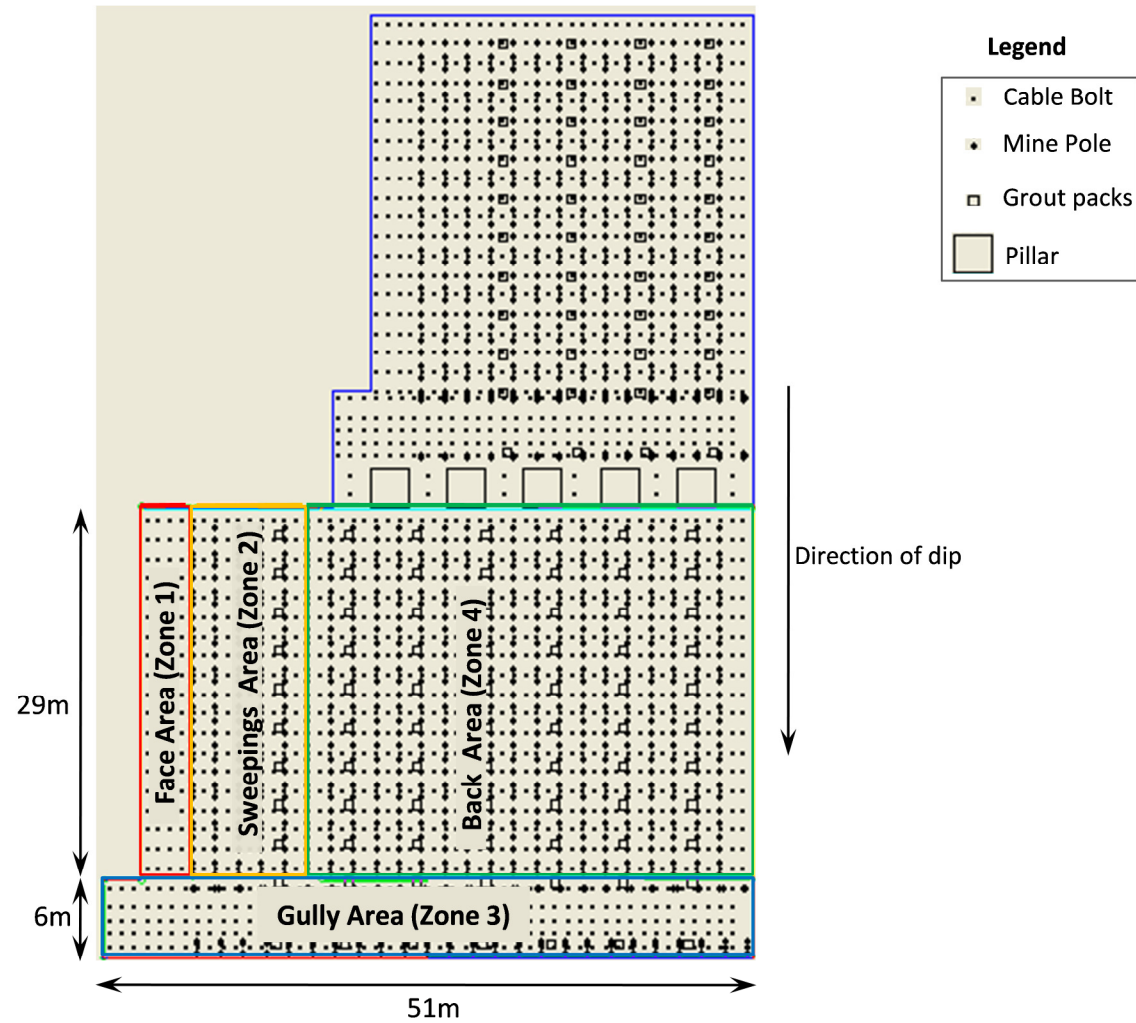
JBlock support layout for 12T 1.5m cable anchors and mine poles support layout
